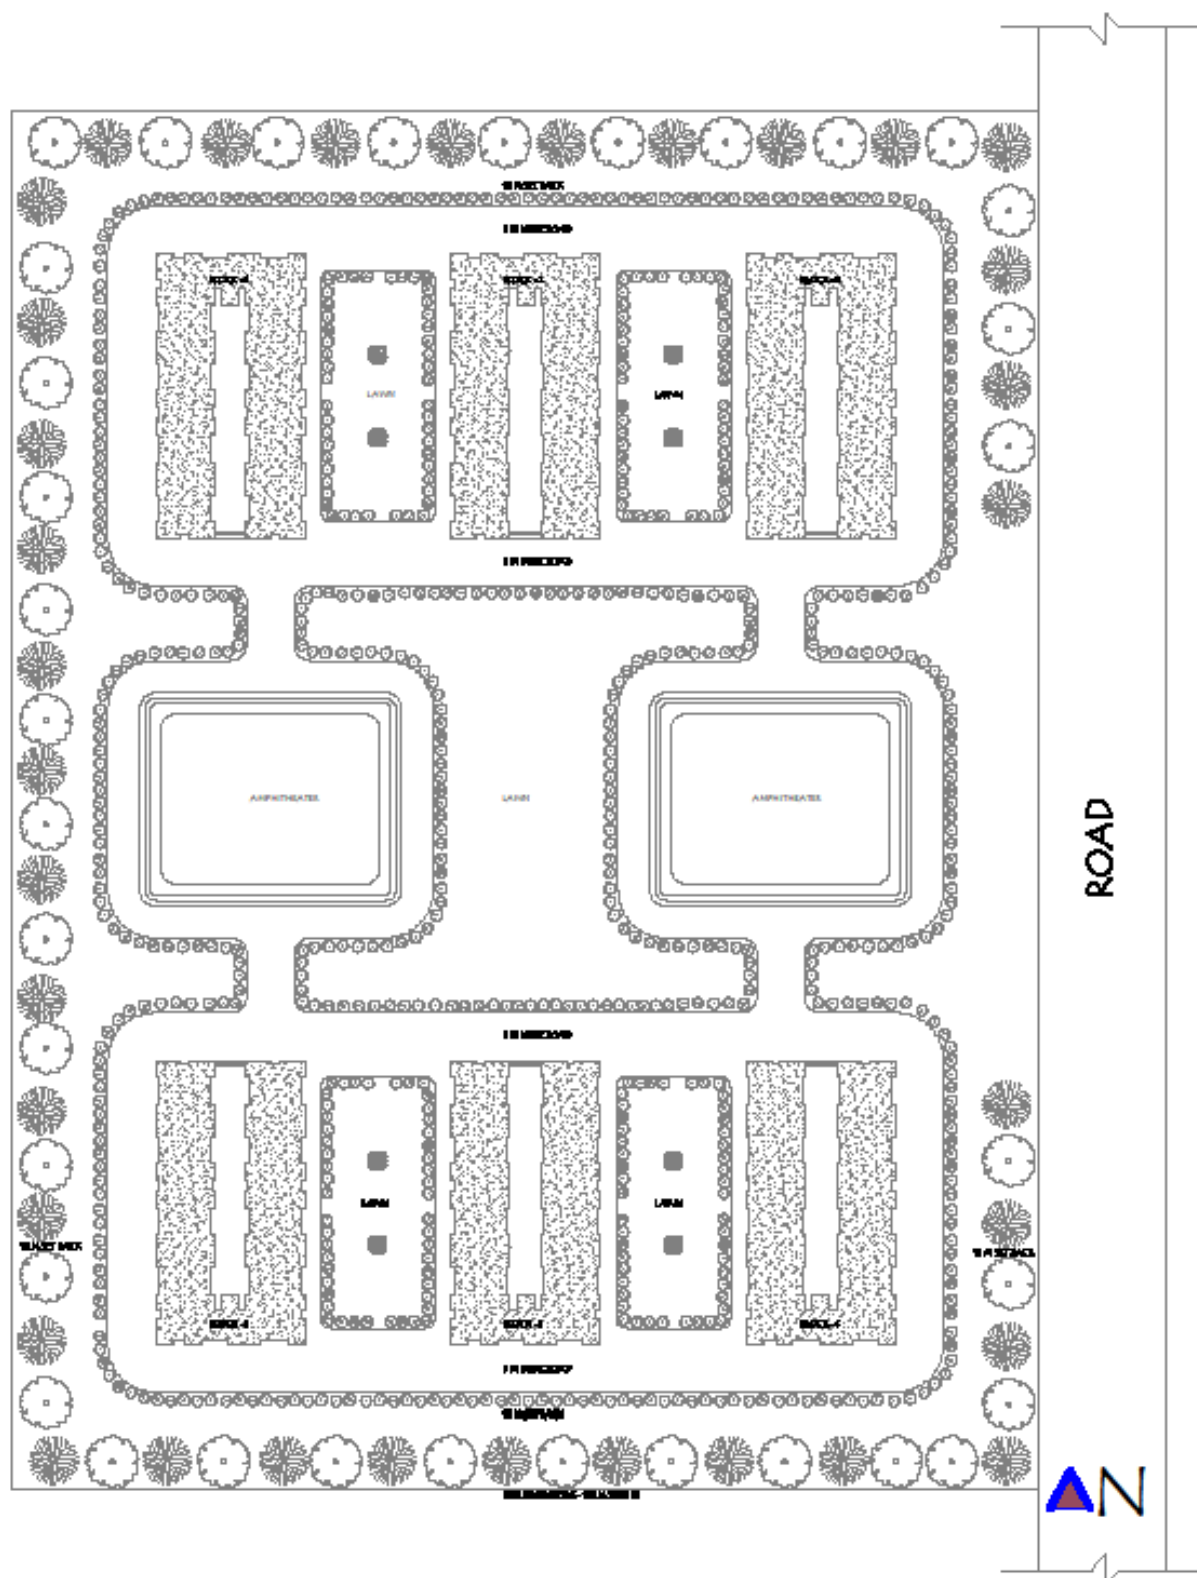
Site Plan, Hypothetical site at noida sector-19 (Author, 2021)
